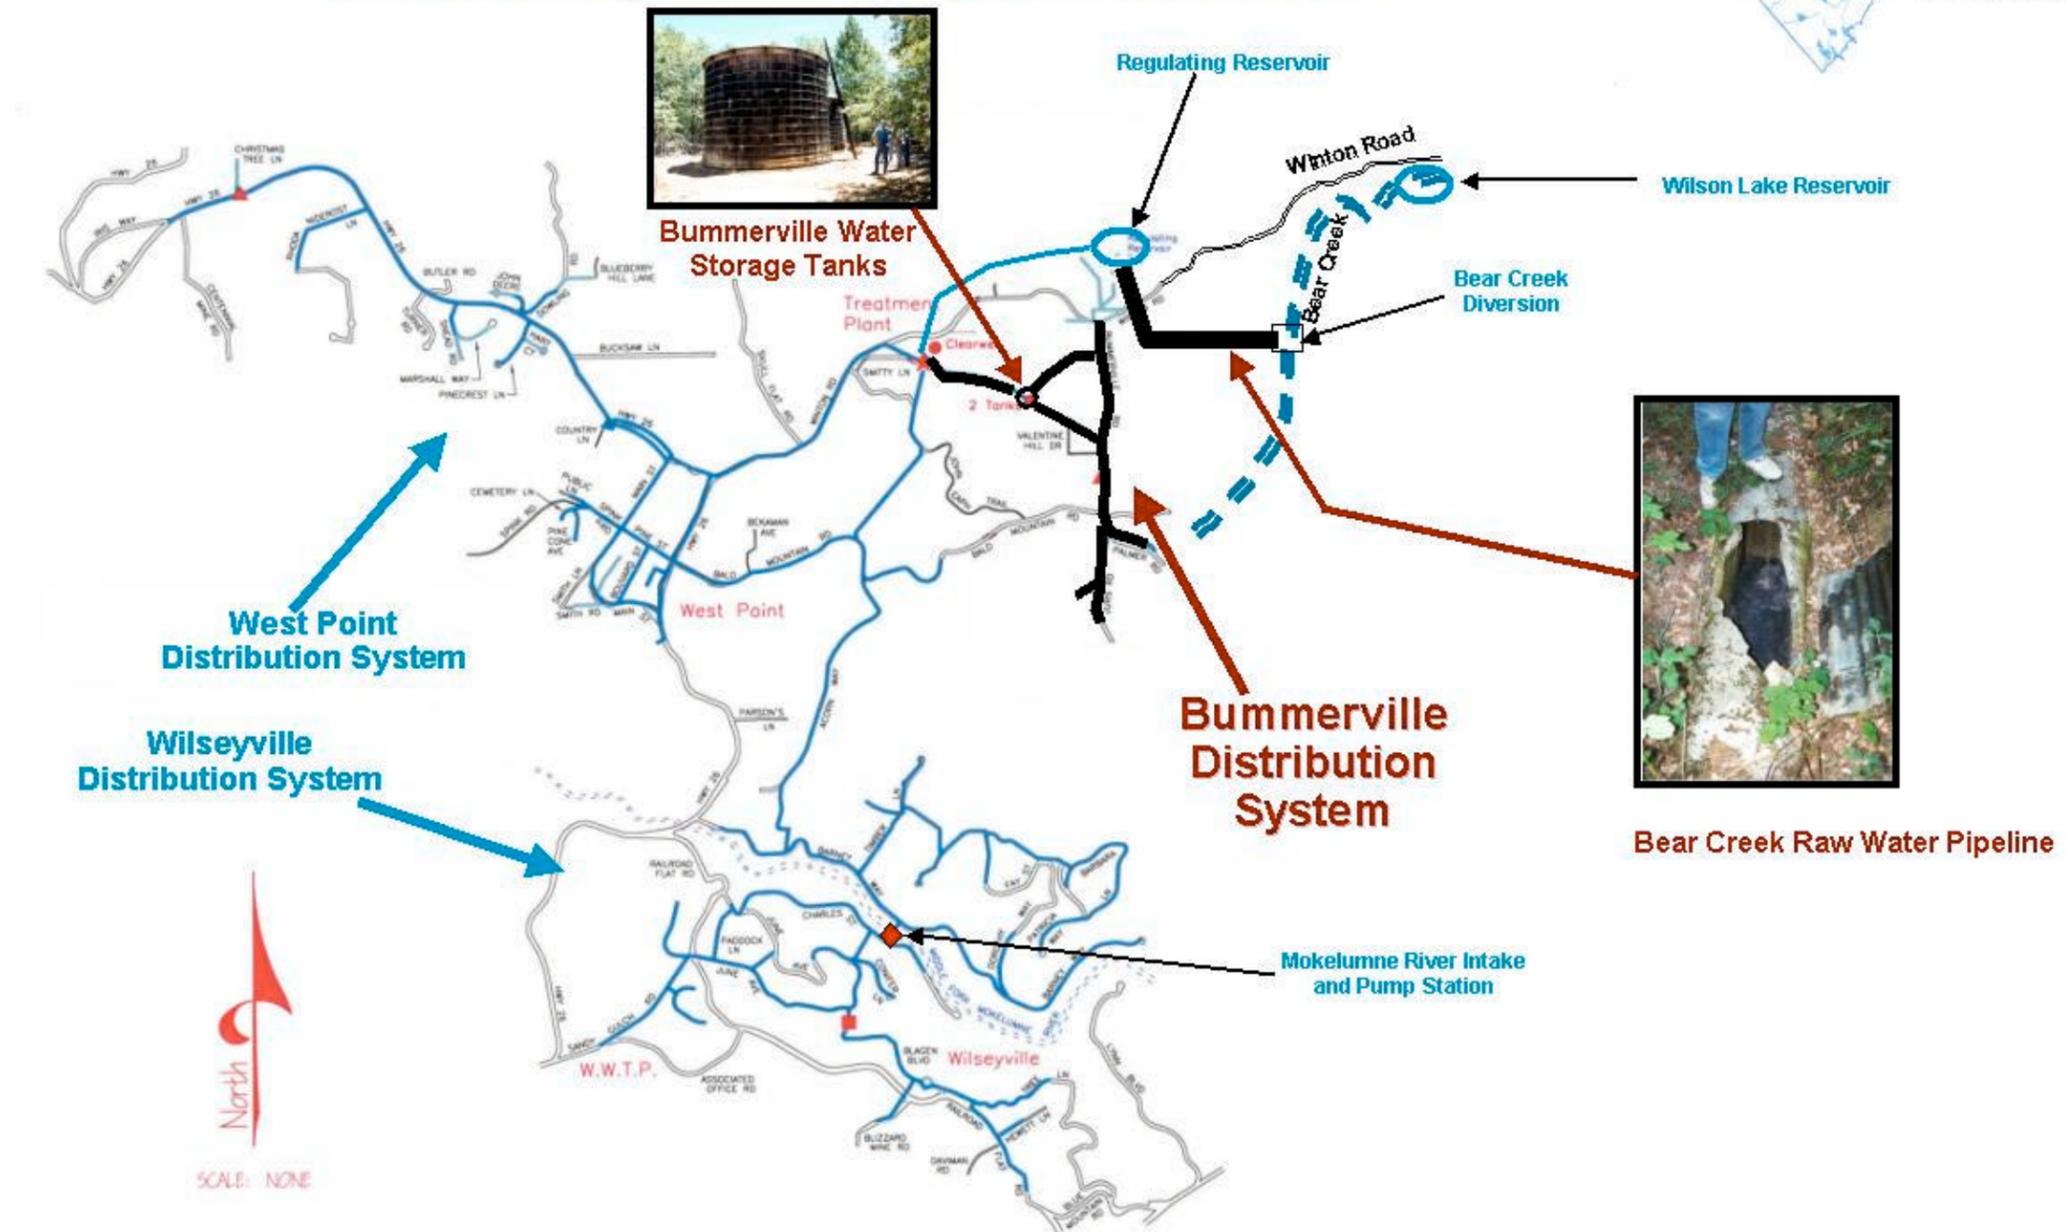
West Point, Wilseyville and Bummerville water supply system
